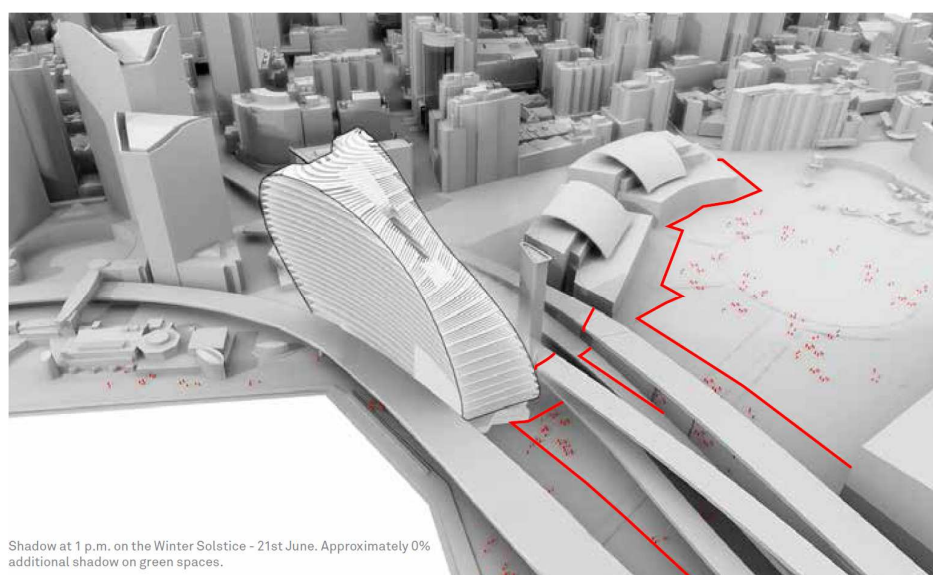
Option 7: expand the existing building footprint and height and construct a new building with a unique built form. (Source: HASSELL)
